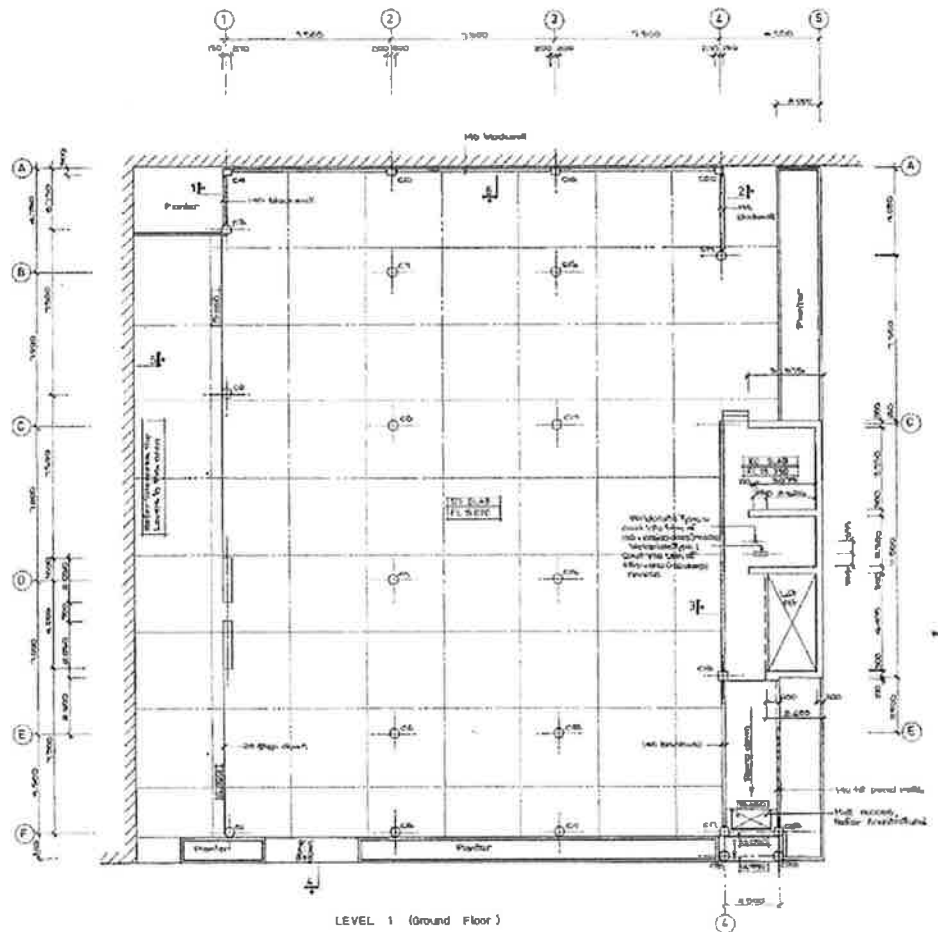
Level 1 ground floor slab layout (extract DENG Dwg S9)
